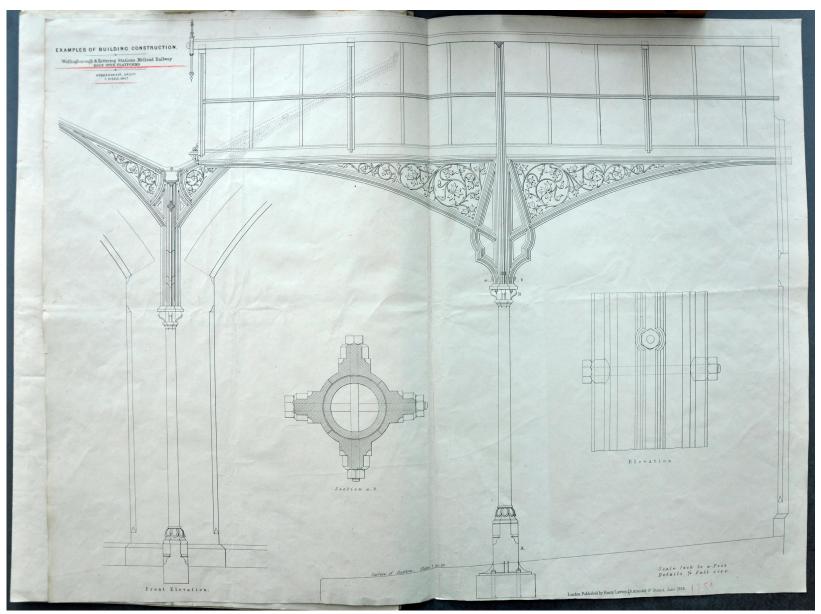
Detailed drawings of the 1857 canopy signed by Driver and reproduced in Henry Laxton's *Examples of Building Construction* in 1858
